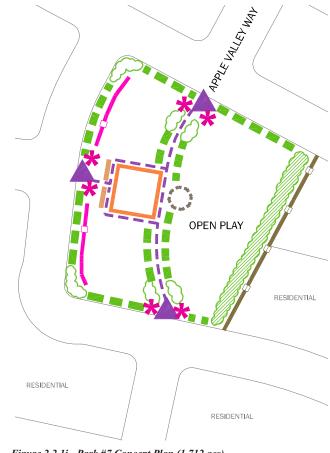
Park #7 Concept Plan (1.712 acs)
